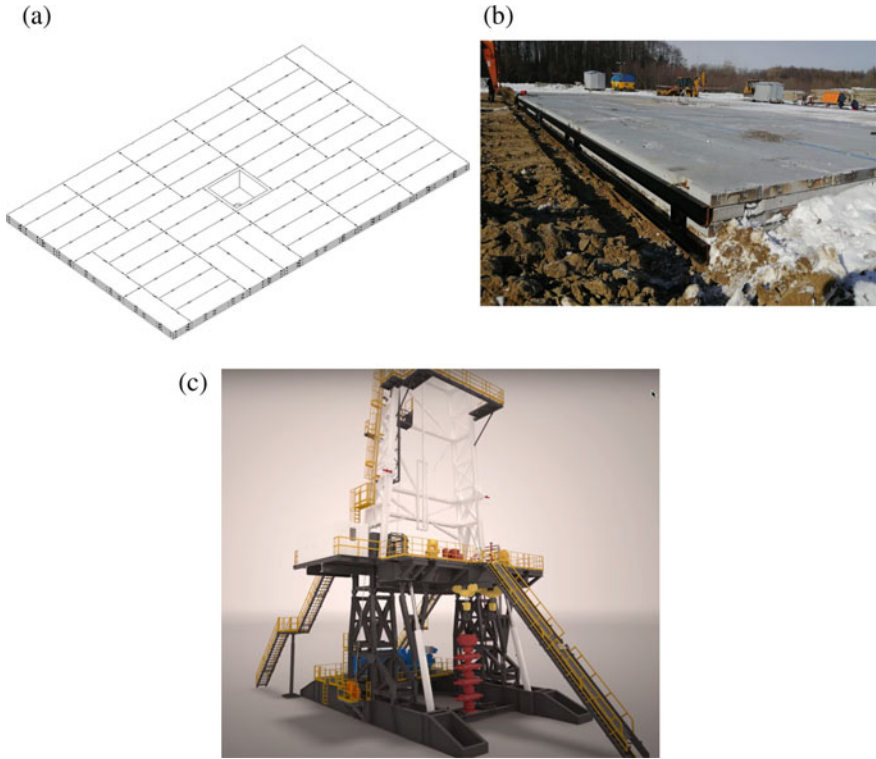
Spatial view (a) and photo of foundation (b) and drilling rig (c)
